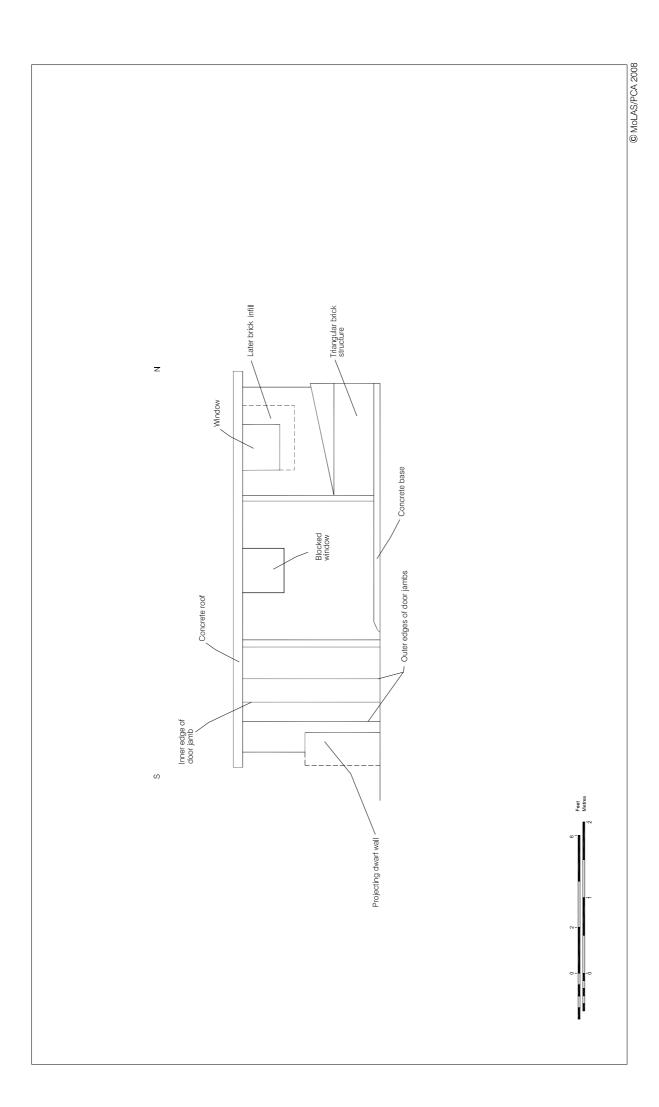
Building 8, pillbox, west elevation 1:50 at A4
